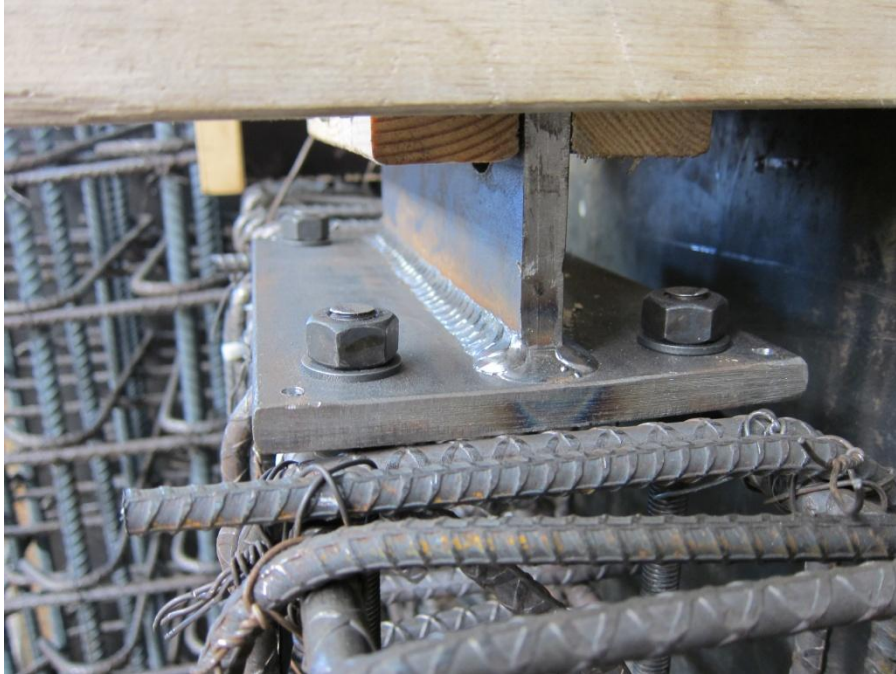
Photo of Wall Specimen Right Before Concrete Placement
